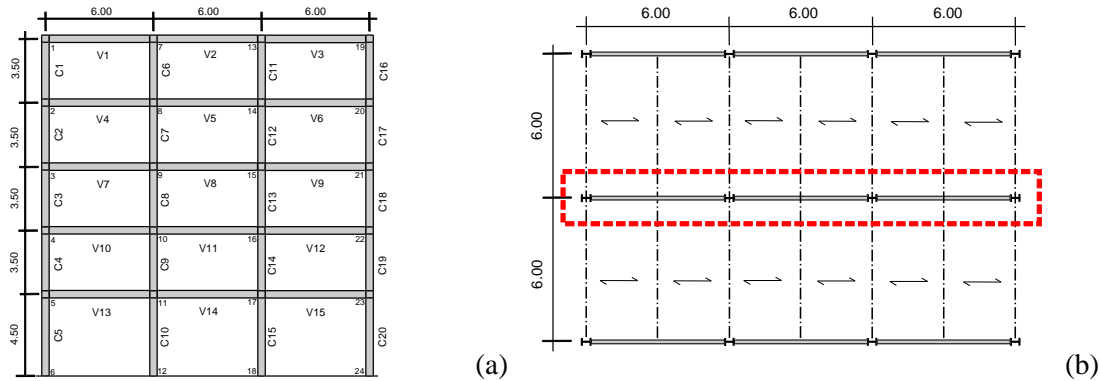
Dimensions, structural elements and nodes naming: (a) elevation view; (b) and plan view.
